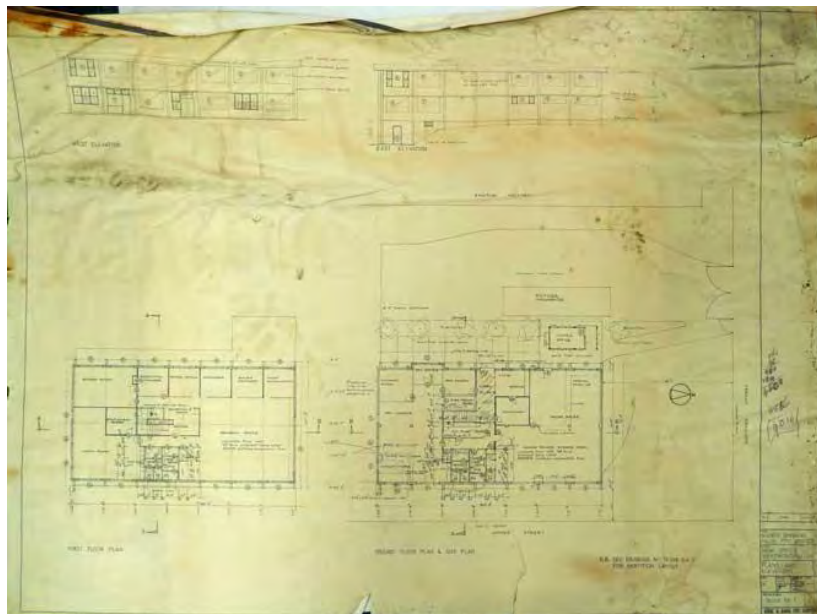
Drawings for construction of the Offices building 1963. (Source: Pacific Brands plan room)
